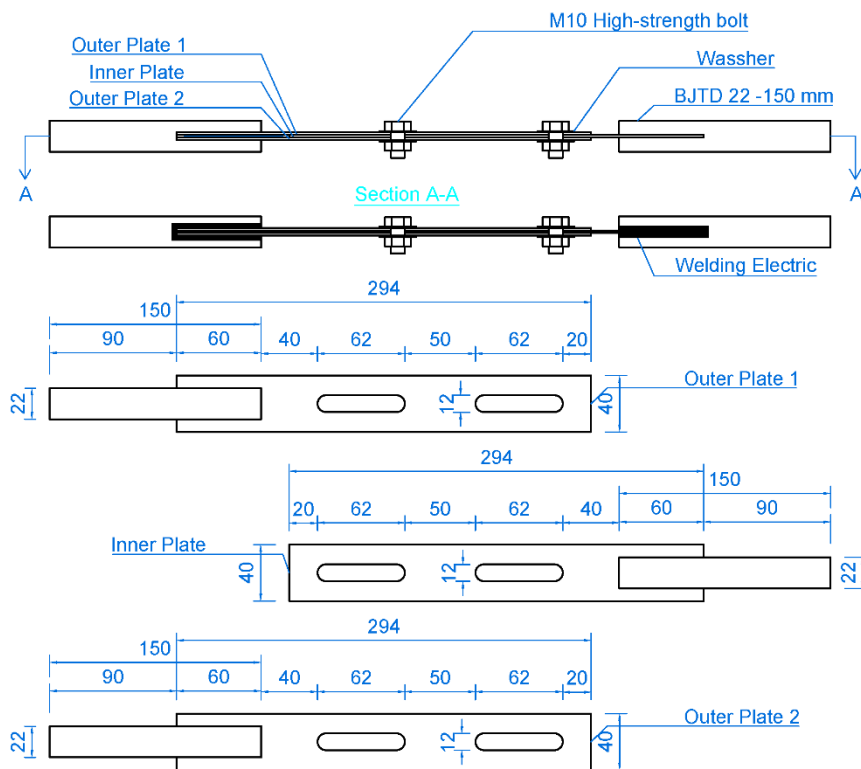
Specimens for frictional tensile resistance testing of slip-resistant bolted joints (all dimensions in mm)
